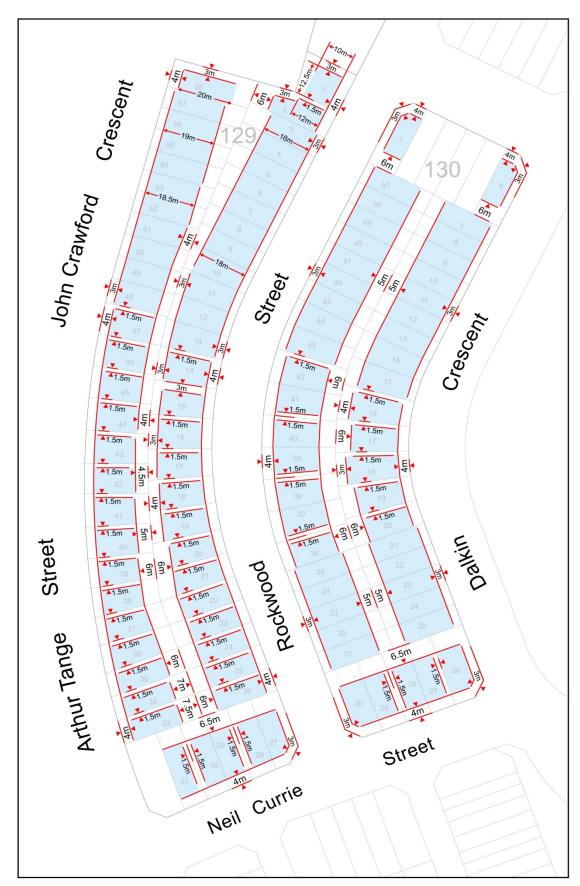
Detail of Maximum Building Zone - sections 129 and 130
